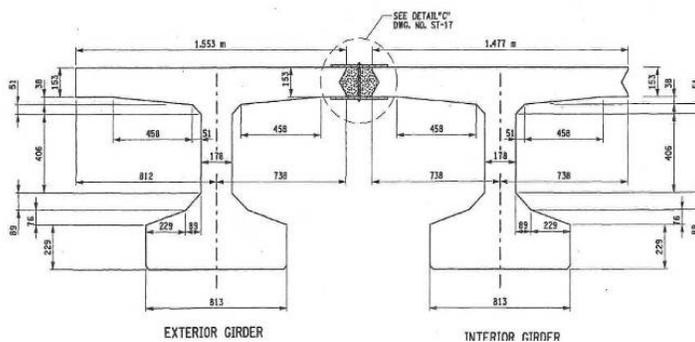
Section showing Side-by-side Bulb-Tees with UHPC Joint Fill connecting the flanges¹⁰
